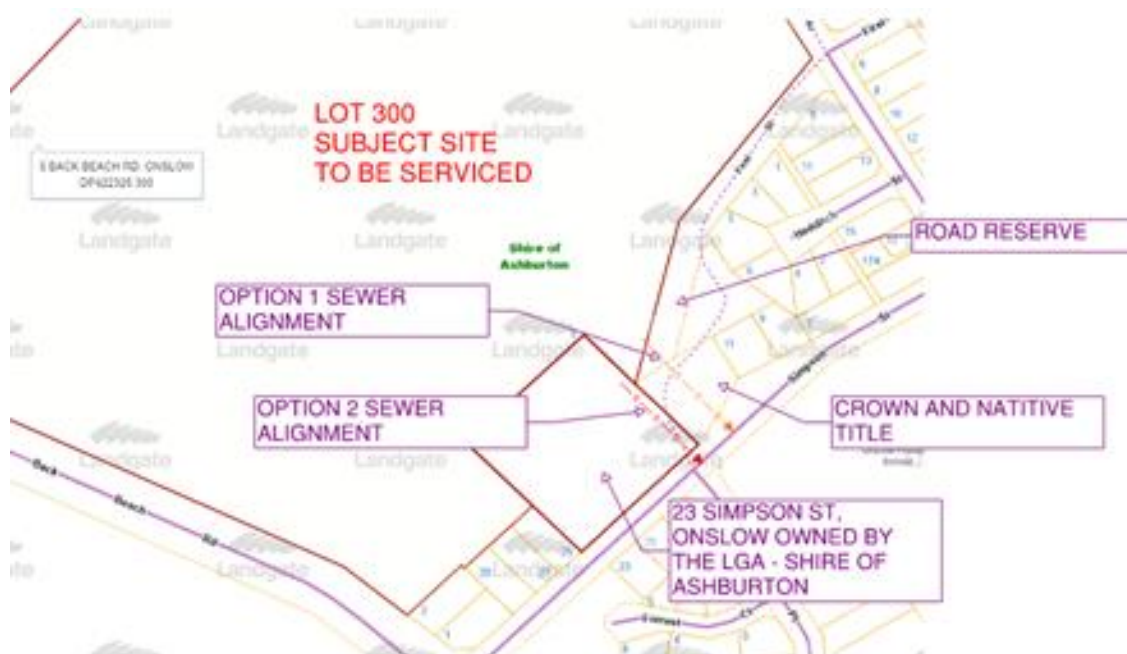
Engineering Servicing Report showing sewer connection to Simpson Street via an unconstructed road reserve and Unallocated Crown Land (UCL) Lot 710 on Deposited Plan 400278.
